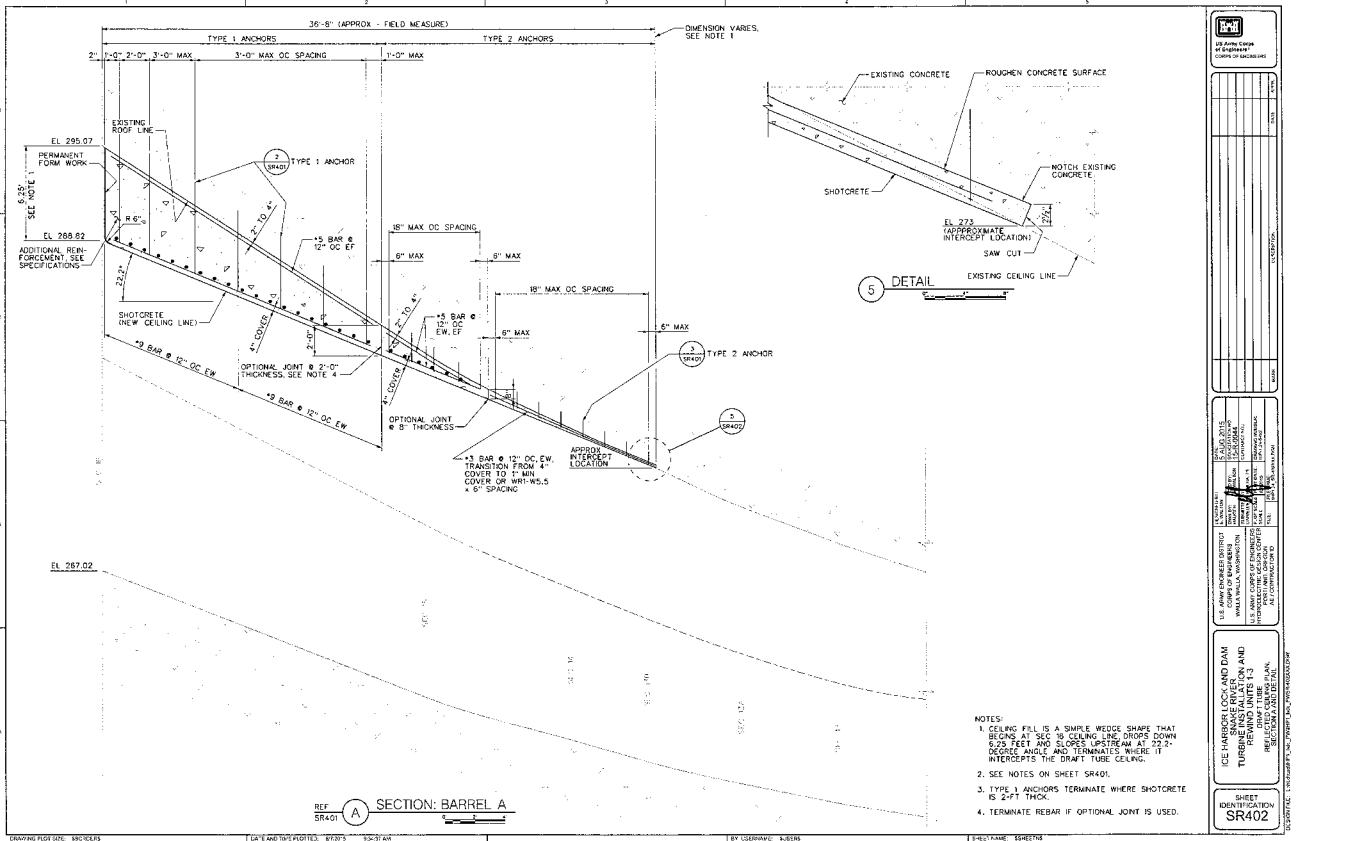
Sectional view of reinforced shotcrete modifications to draft tube
